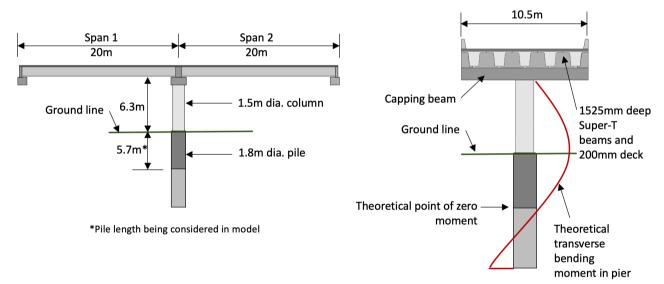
Prototype bridge structure: (left) longitudinal profile and (right) elevation view.
